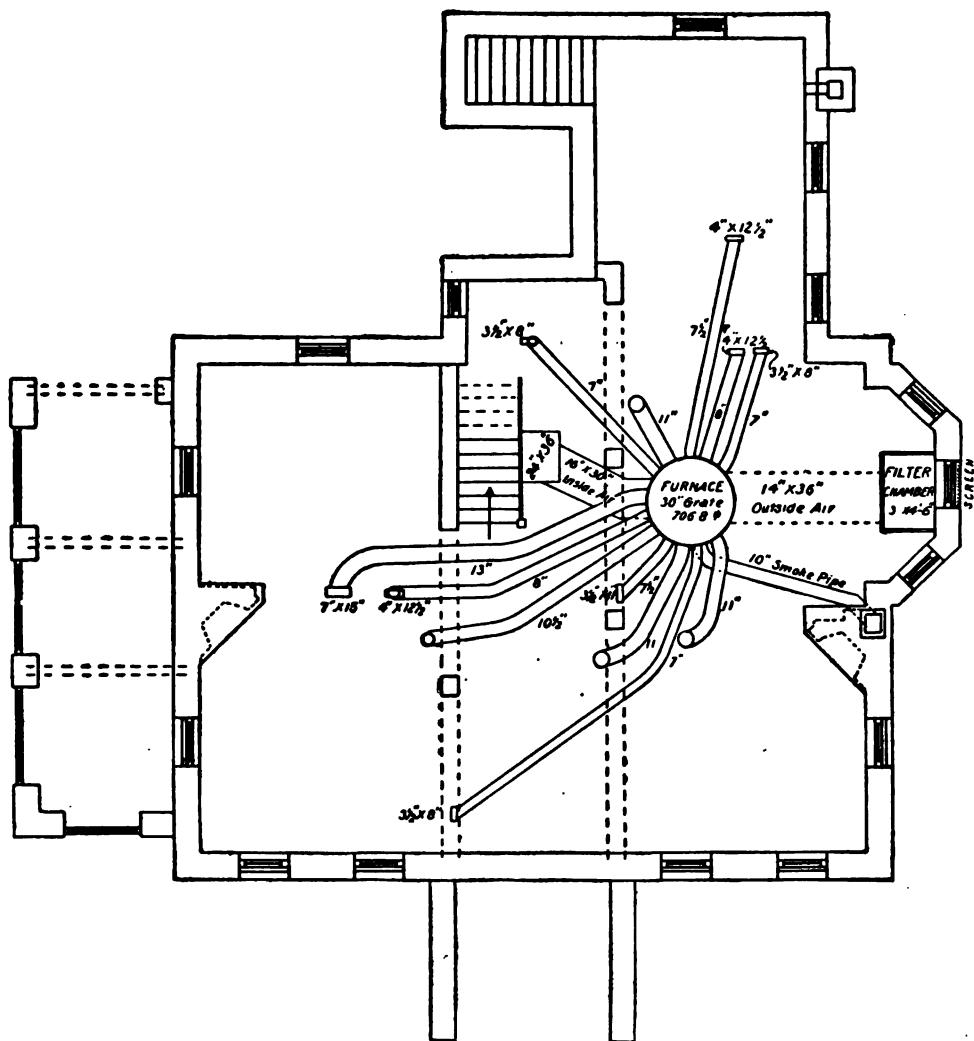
Basement Plan, Showing Method of Locating Furnace and Piping
